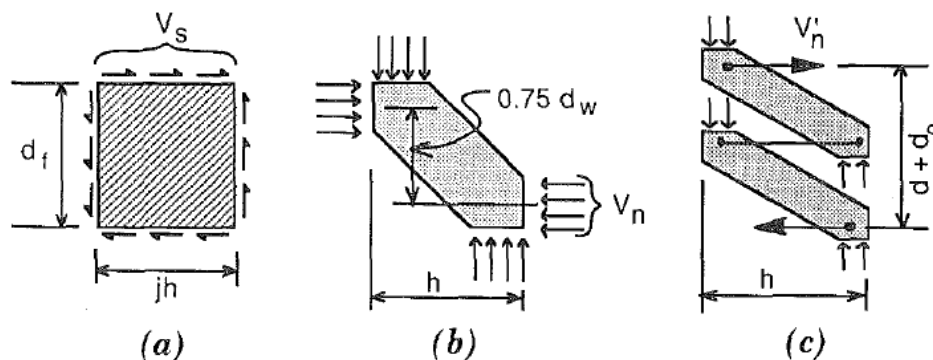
Contributions to the Panel Shear (a) Steel Web Panel; (b) Concrete Compression Strut; (c) Concrete Compression Field (Deierlein, Sheikh et al. 1989)
